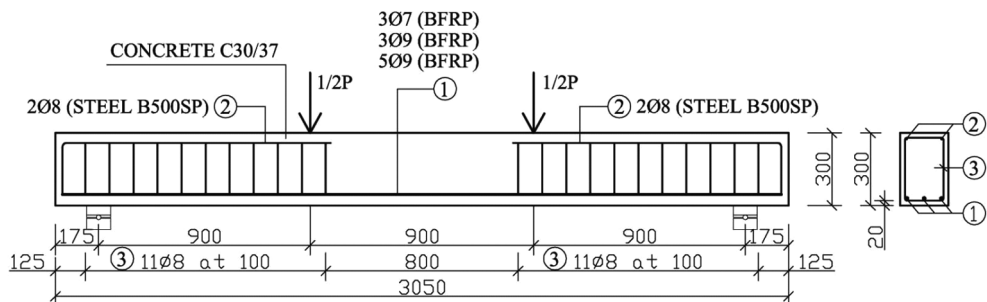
Geometry and reinforcement of BFRP RC beams (dimensions in mm)
